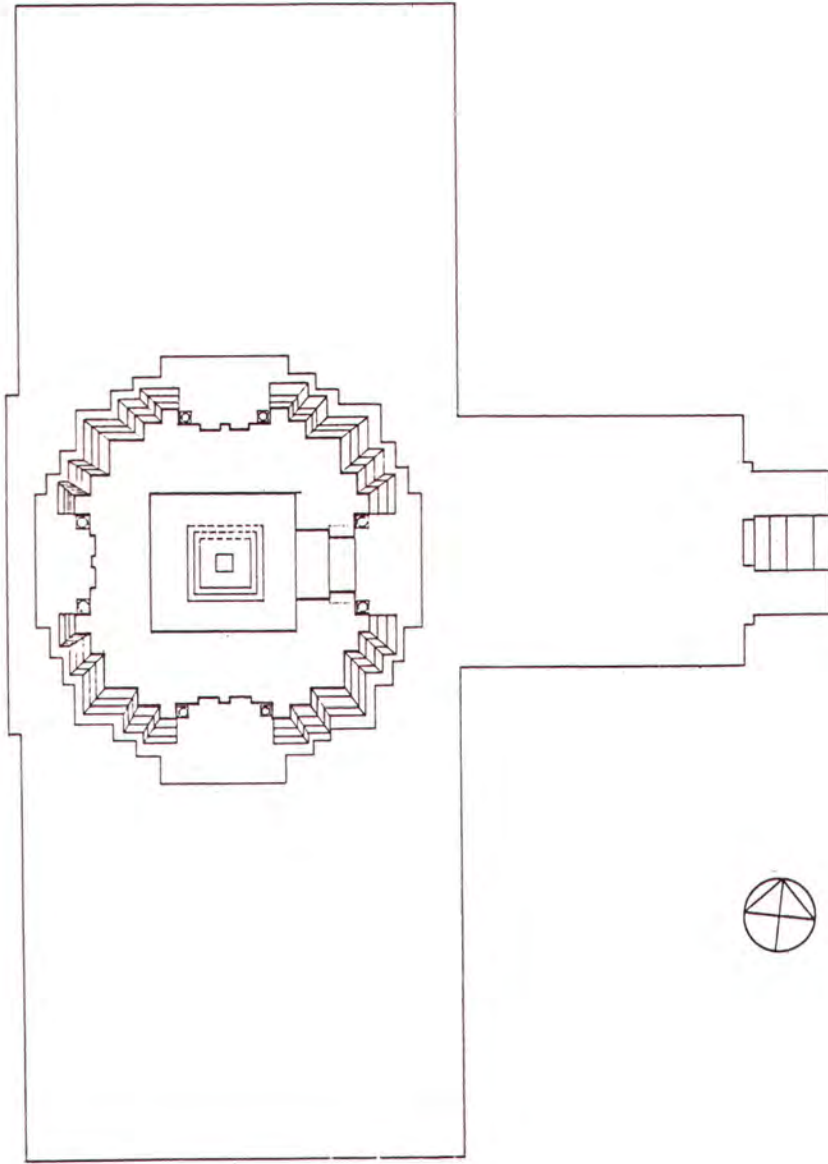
Plan of Prasat Ban Plueng, Surin Province.
